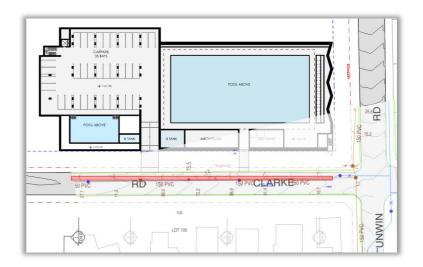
Aquatic centre - water main adjacent to building Clarke Road
